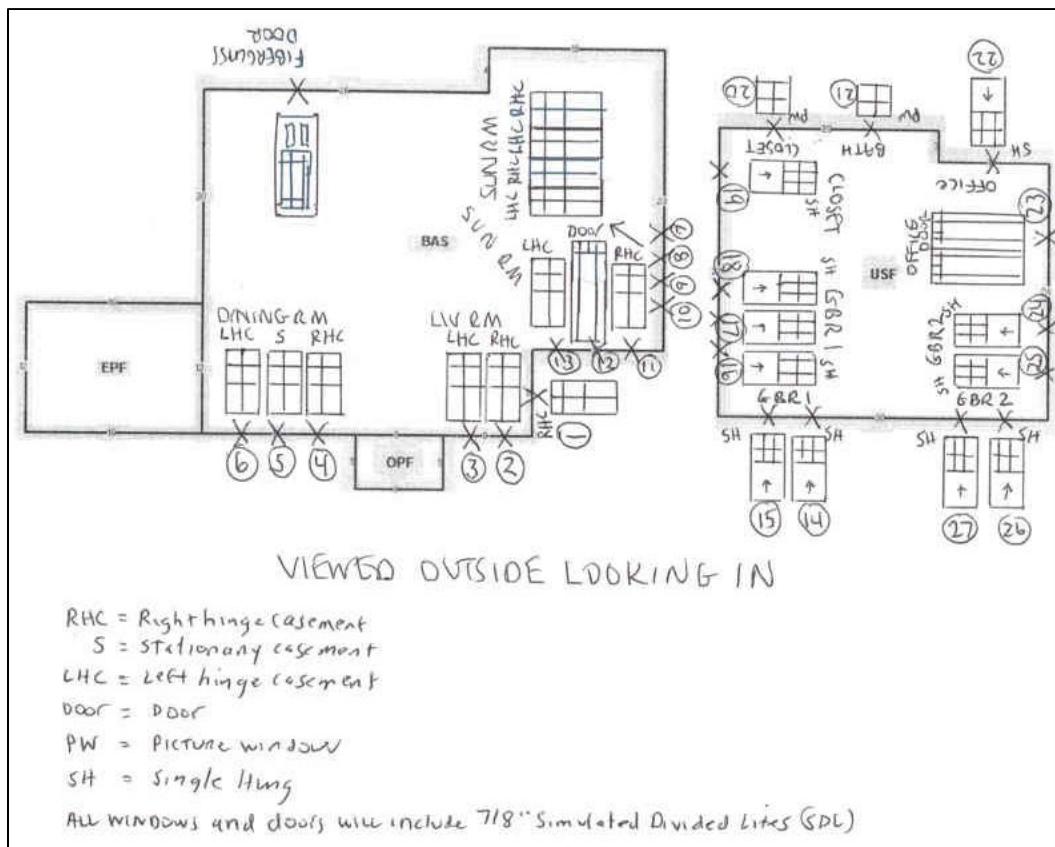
Site plan showing the windows to be replaced on the west elevation.
